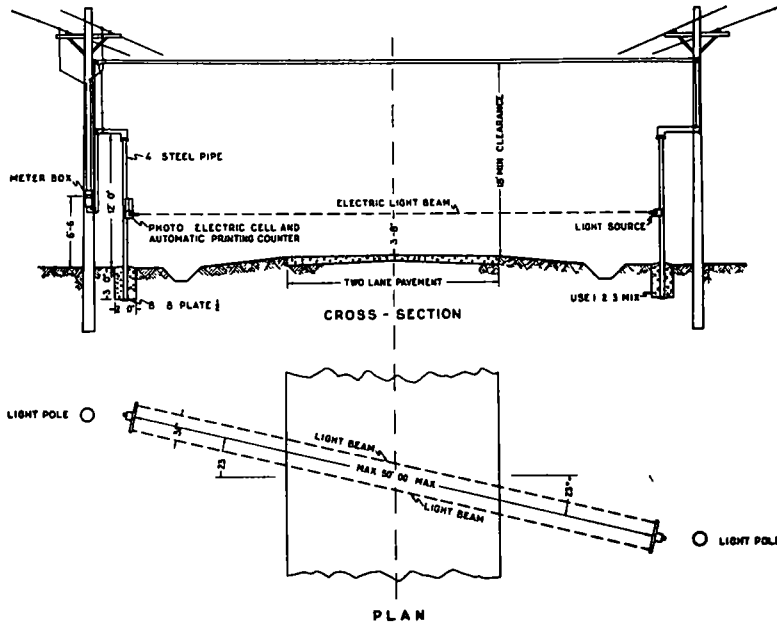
Proposed Layout of Automatic Traffic-Counter Installation
